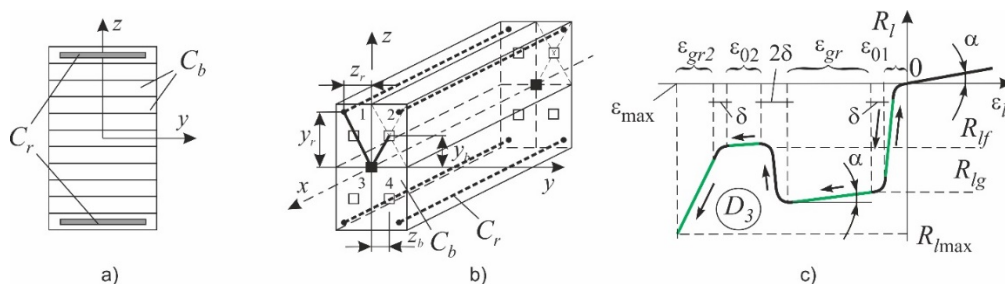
Modeling of deformation of reinforced concrete beams (a), columns (b) and soil foundation (c).
